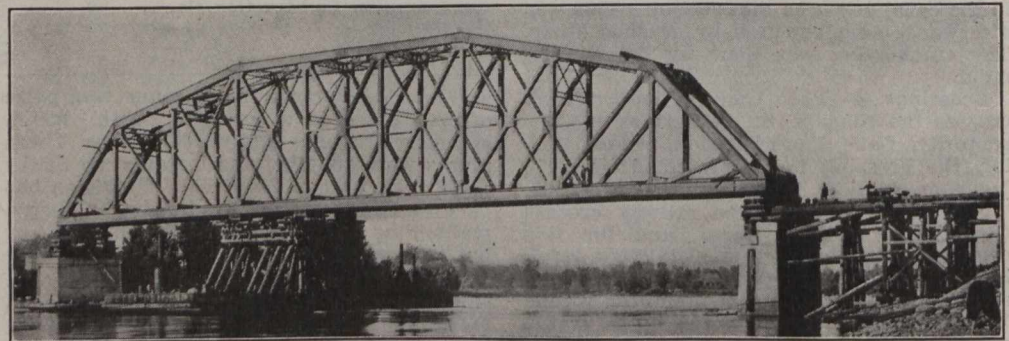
Span in Position Over Pier Ready to Lower to Permanent Position, Riviere-des-Prairies Bridge.
